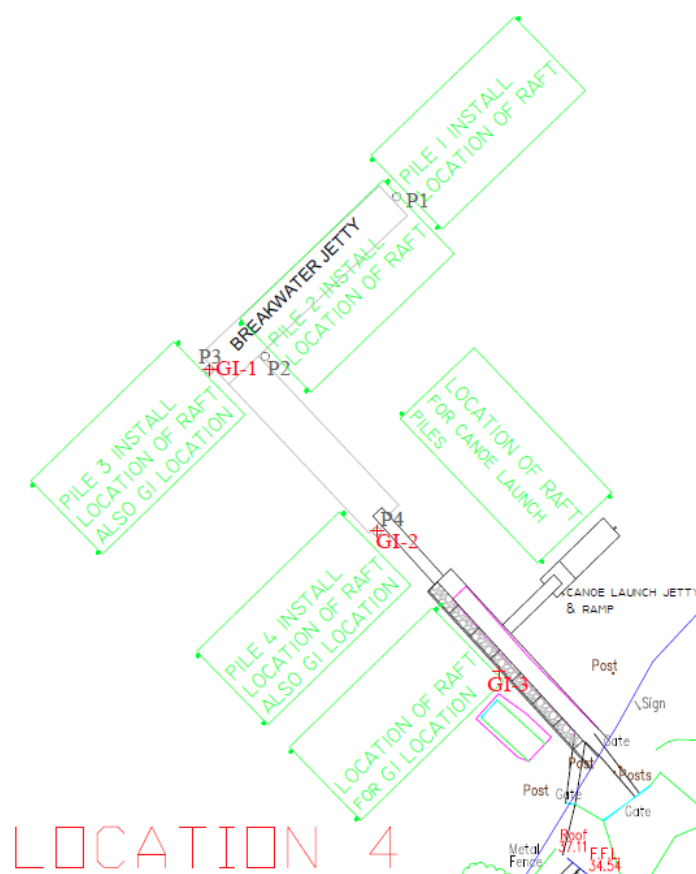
Jetty with proposed SI locations denoted as "GI"
